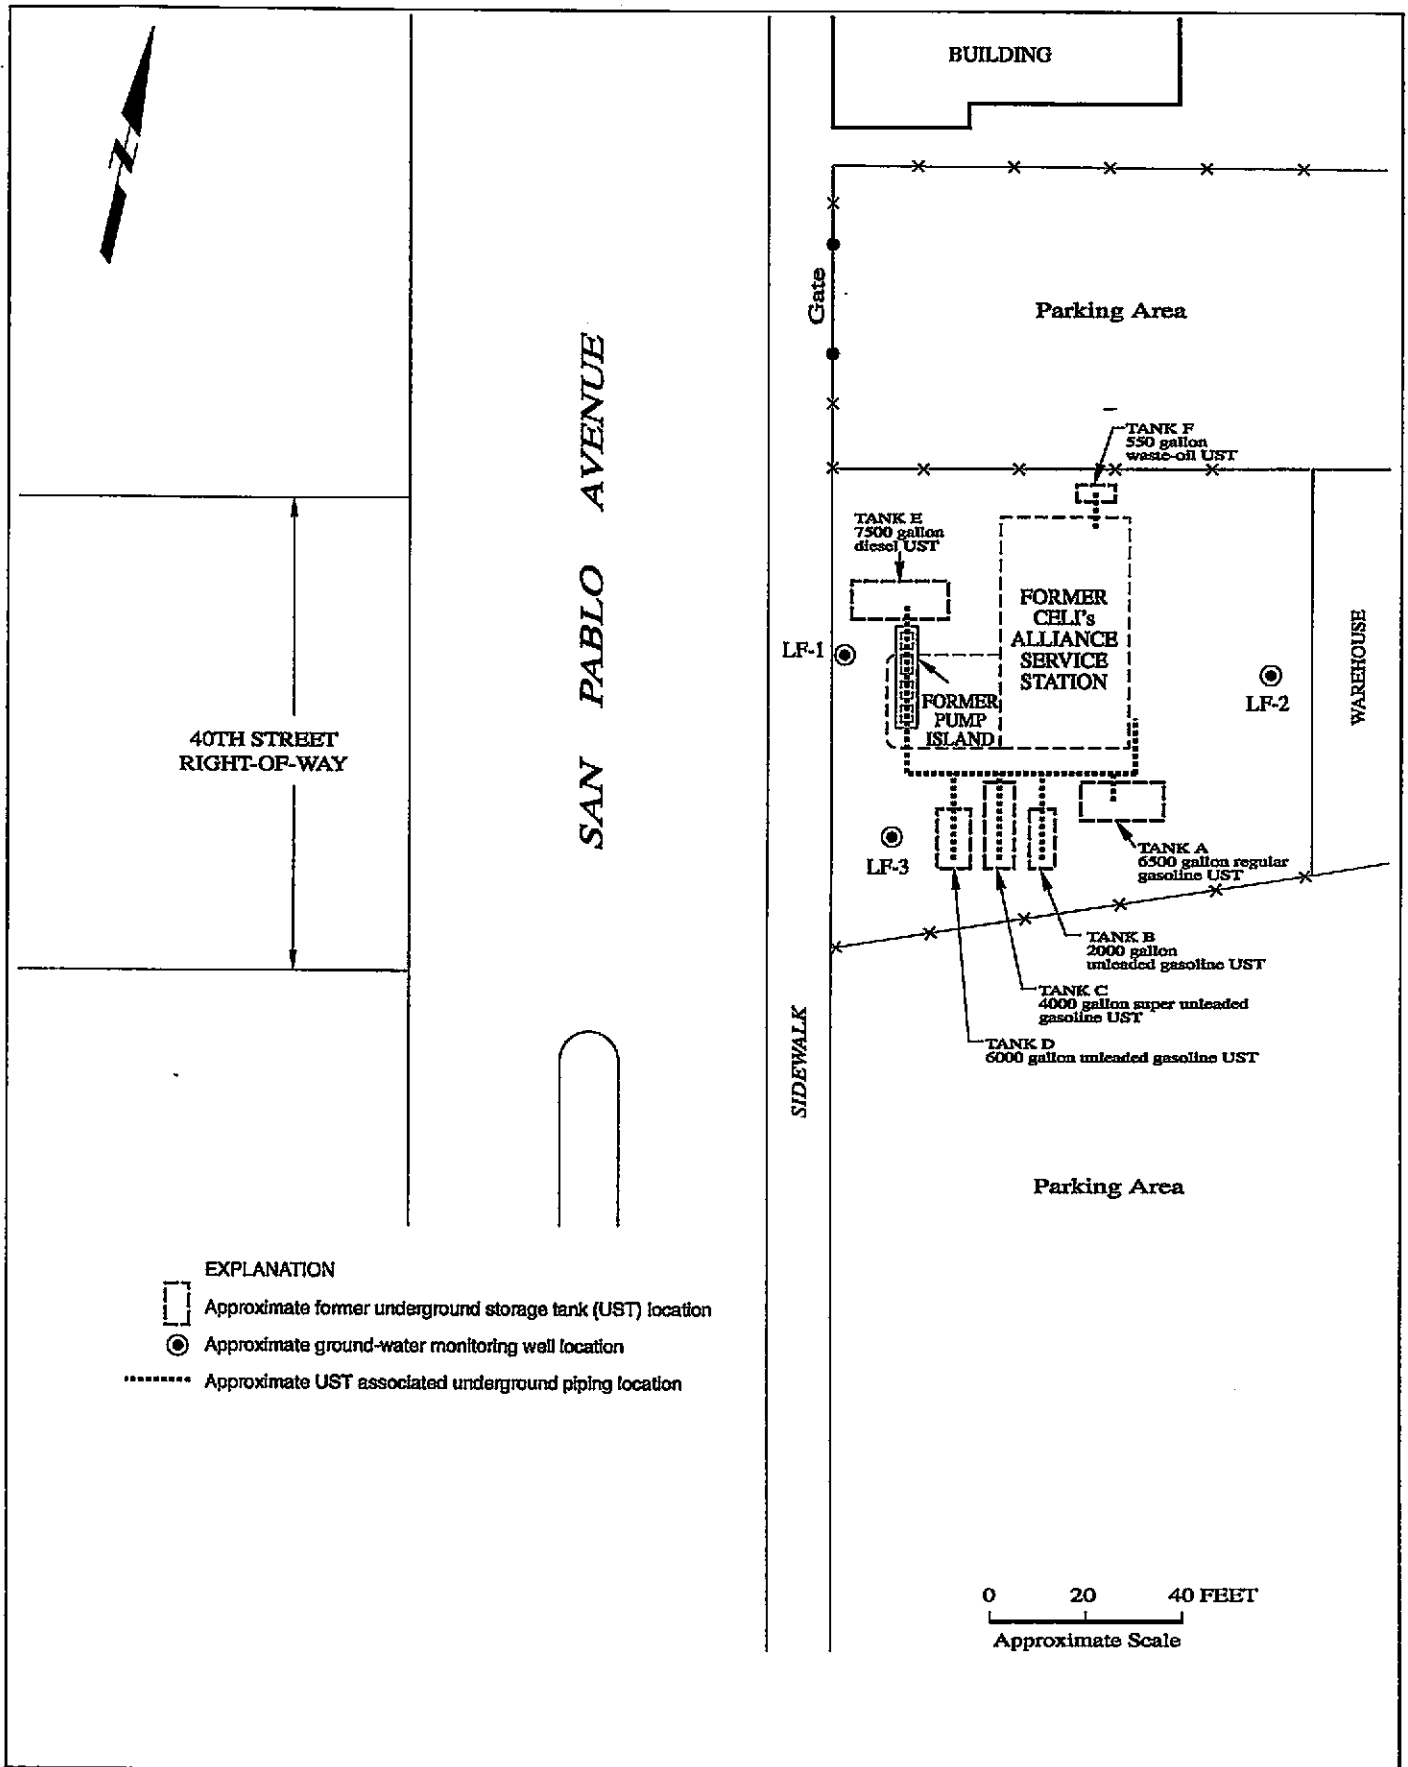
SITE PLAN SHOWING FORMER UNDERGROUND STORAGE TANK LOCATIONS
